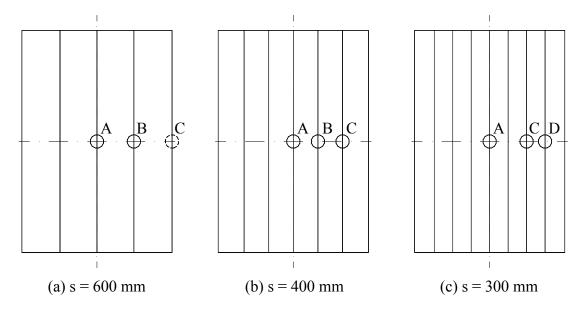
Load points A to D of floors JJI 1 with different joist spacing
